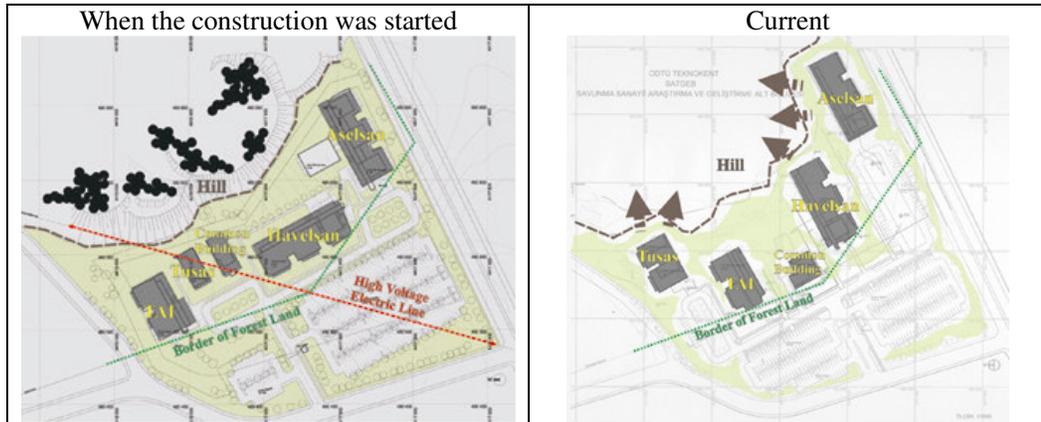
Site Plan of SATGEB (Source: Archive of Teknopark Inc.)
